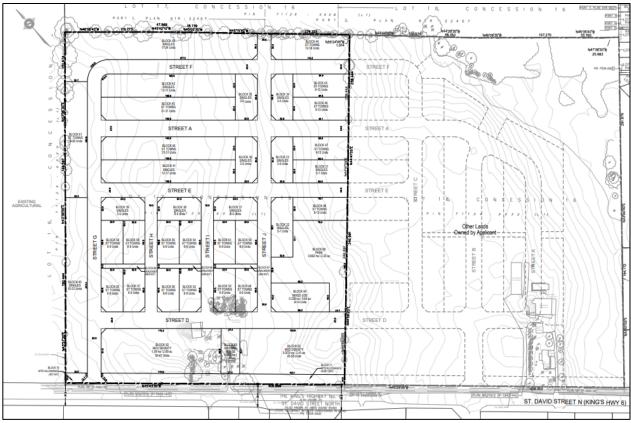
Proposed Draft Plan of Subdivision for Northern Lands (Source: Polocorp Inc.)
